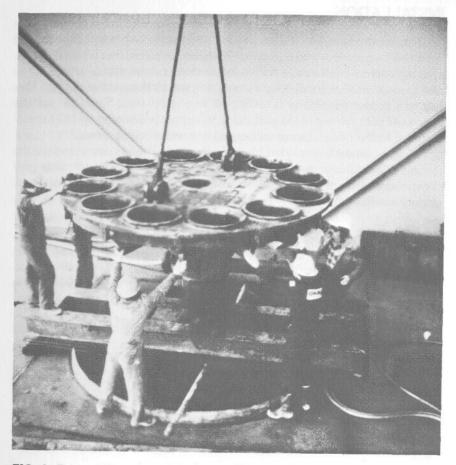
A well bore template is usually supplied by the wellhead manufacturer to ensure alignment and guidance of surface casing will be held within tolerance. (*Courtesy Gray Tool Co.*)
